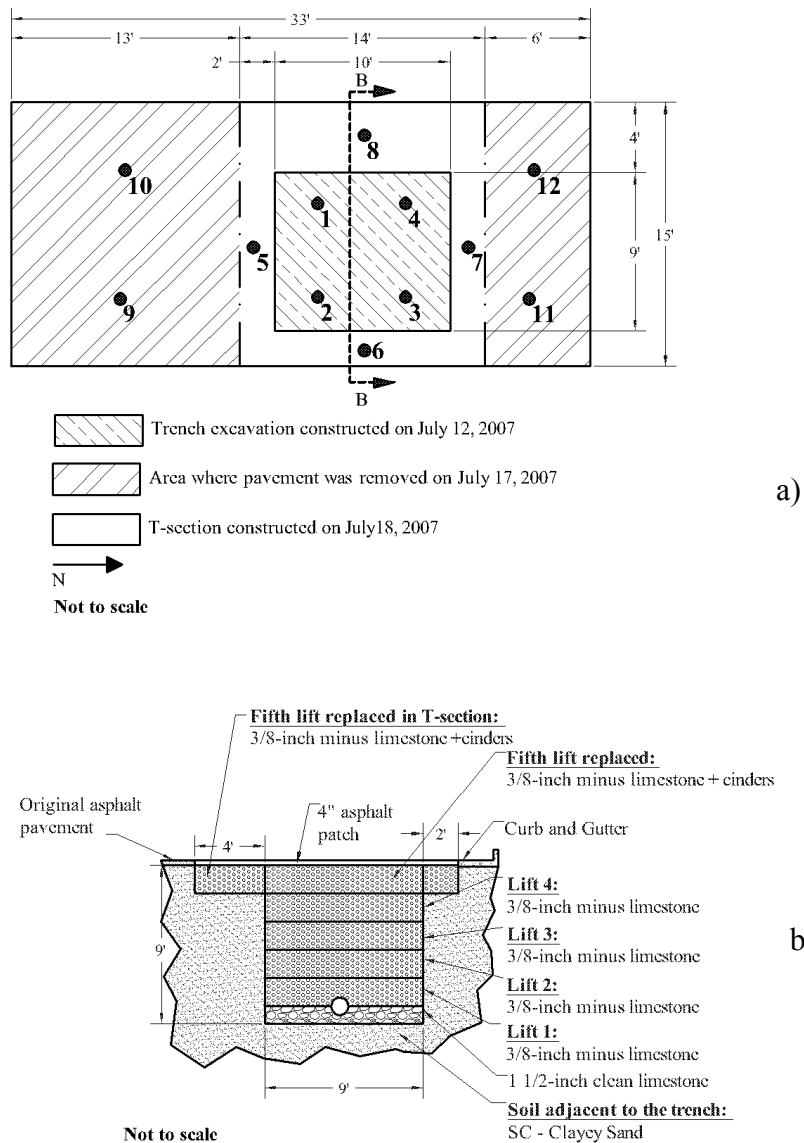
Location of test points in Trench B; cross-section of the trench
